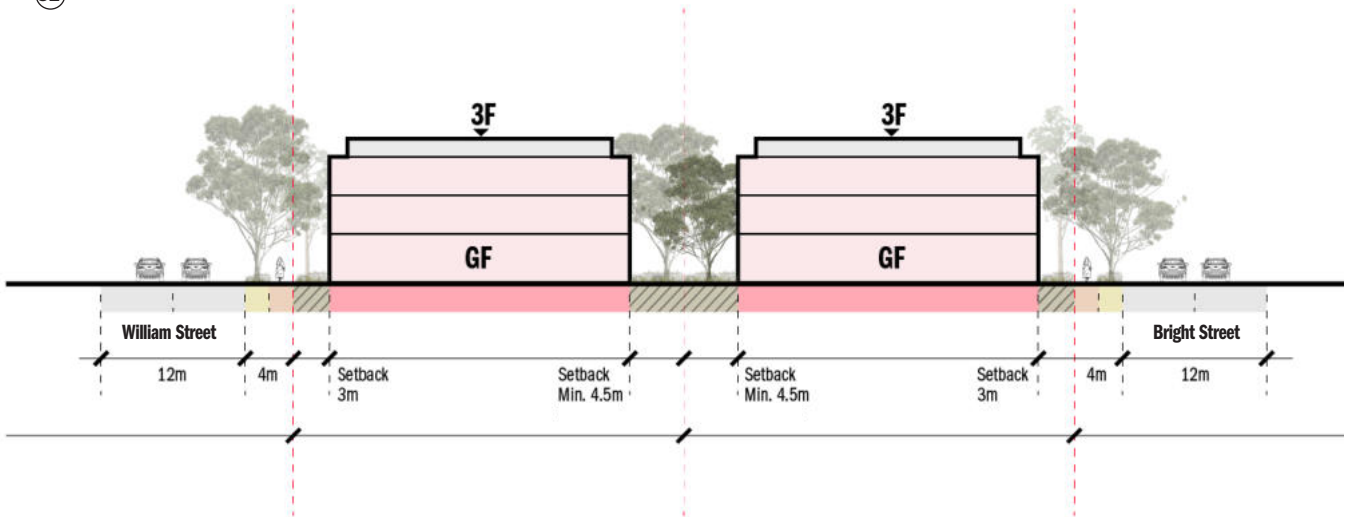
Section 1 - Side cross section showing two uplift lots between William and Brights Streets
